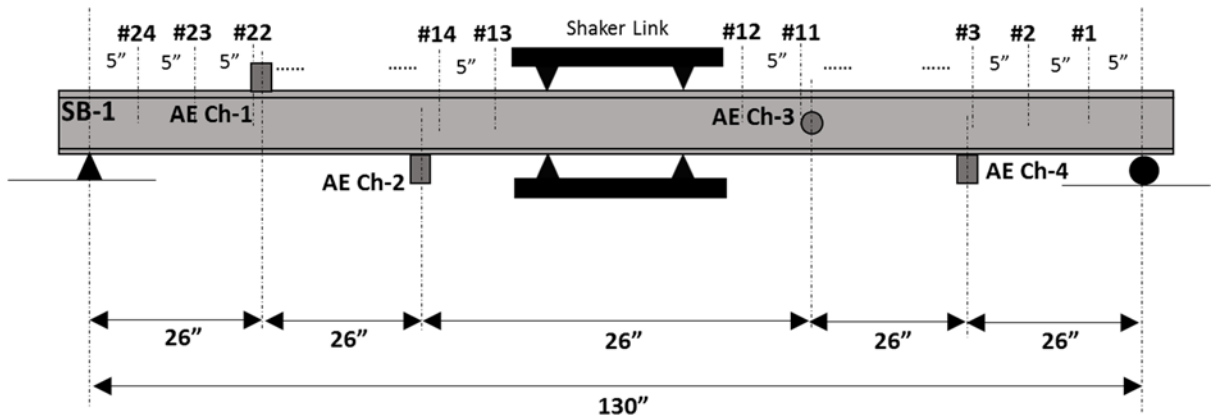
Pencil-lead-break test stations for steel beam SB-1.
